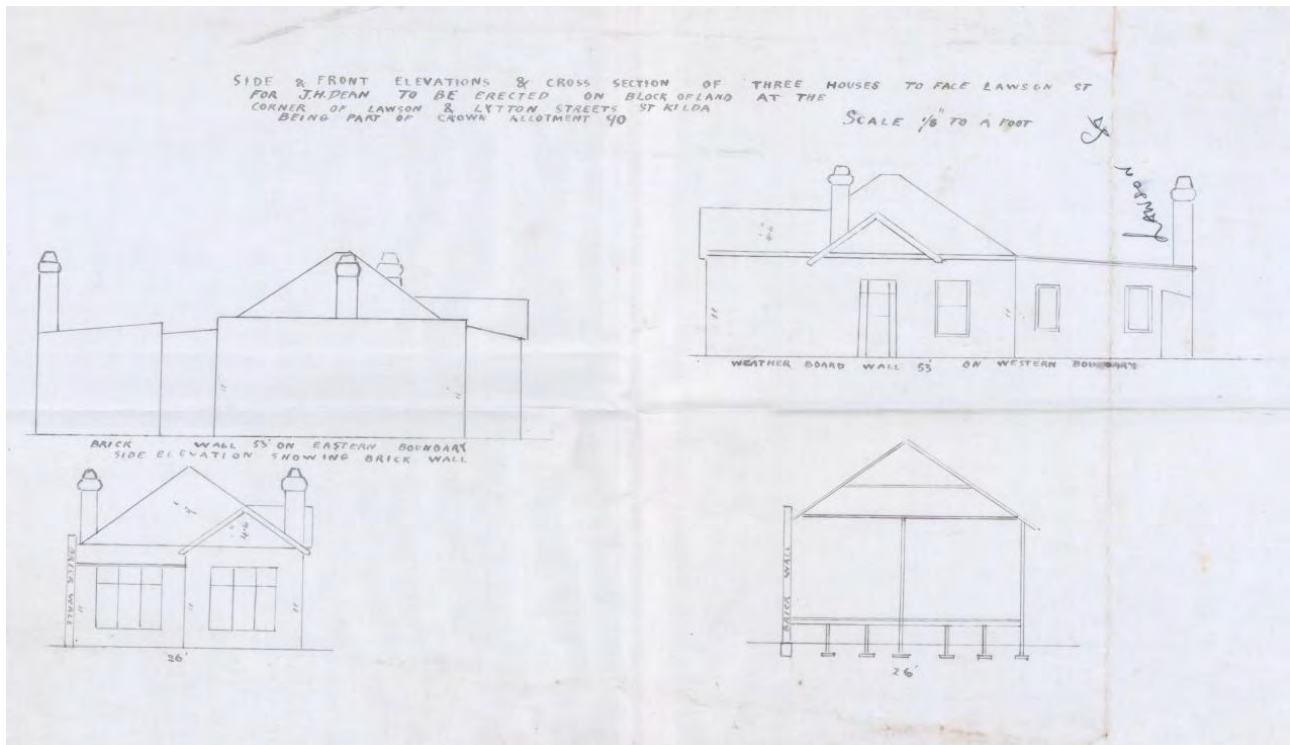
Side and front elevation & cross section of three houses to face Lawson Street to be erected on block of land at the corner of Lawson & Lytton Streets, St Kilda. Source: J. H. Dean. n.d. Drawings of three proposed houses, Lawson Street, Elwood. Council Records. City of Port Phillip.
